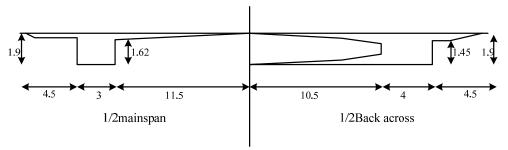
The girder's sectional view of cable-stayed bridge (unit: m).
